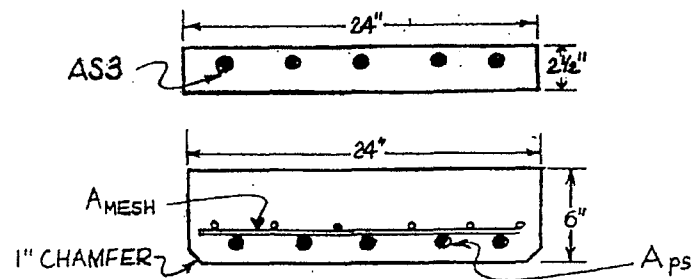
Cross-Section of Beam Tested by CTA-74-B6
